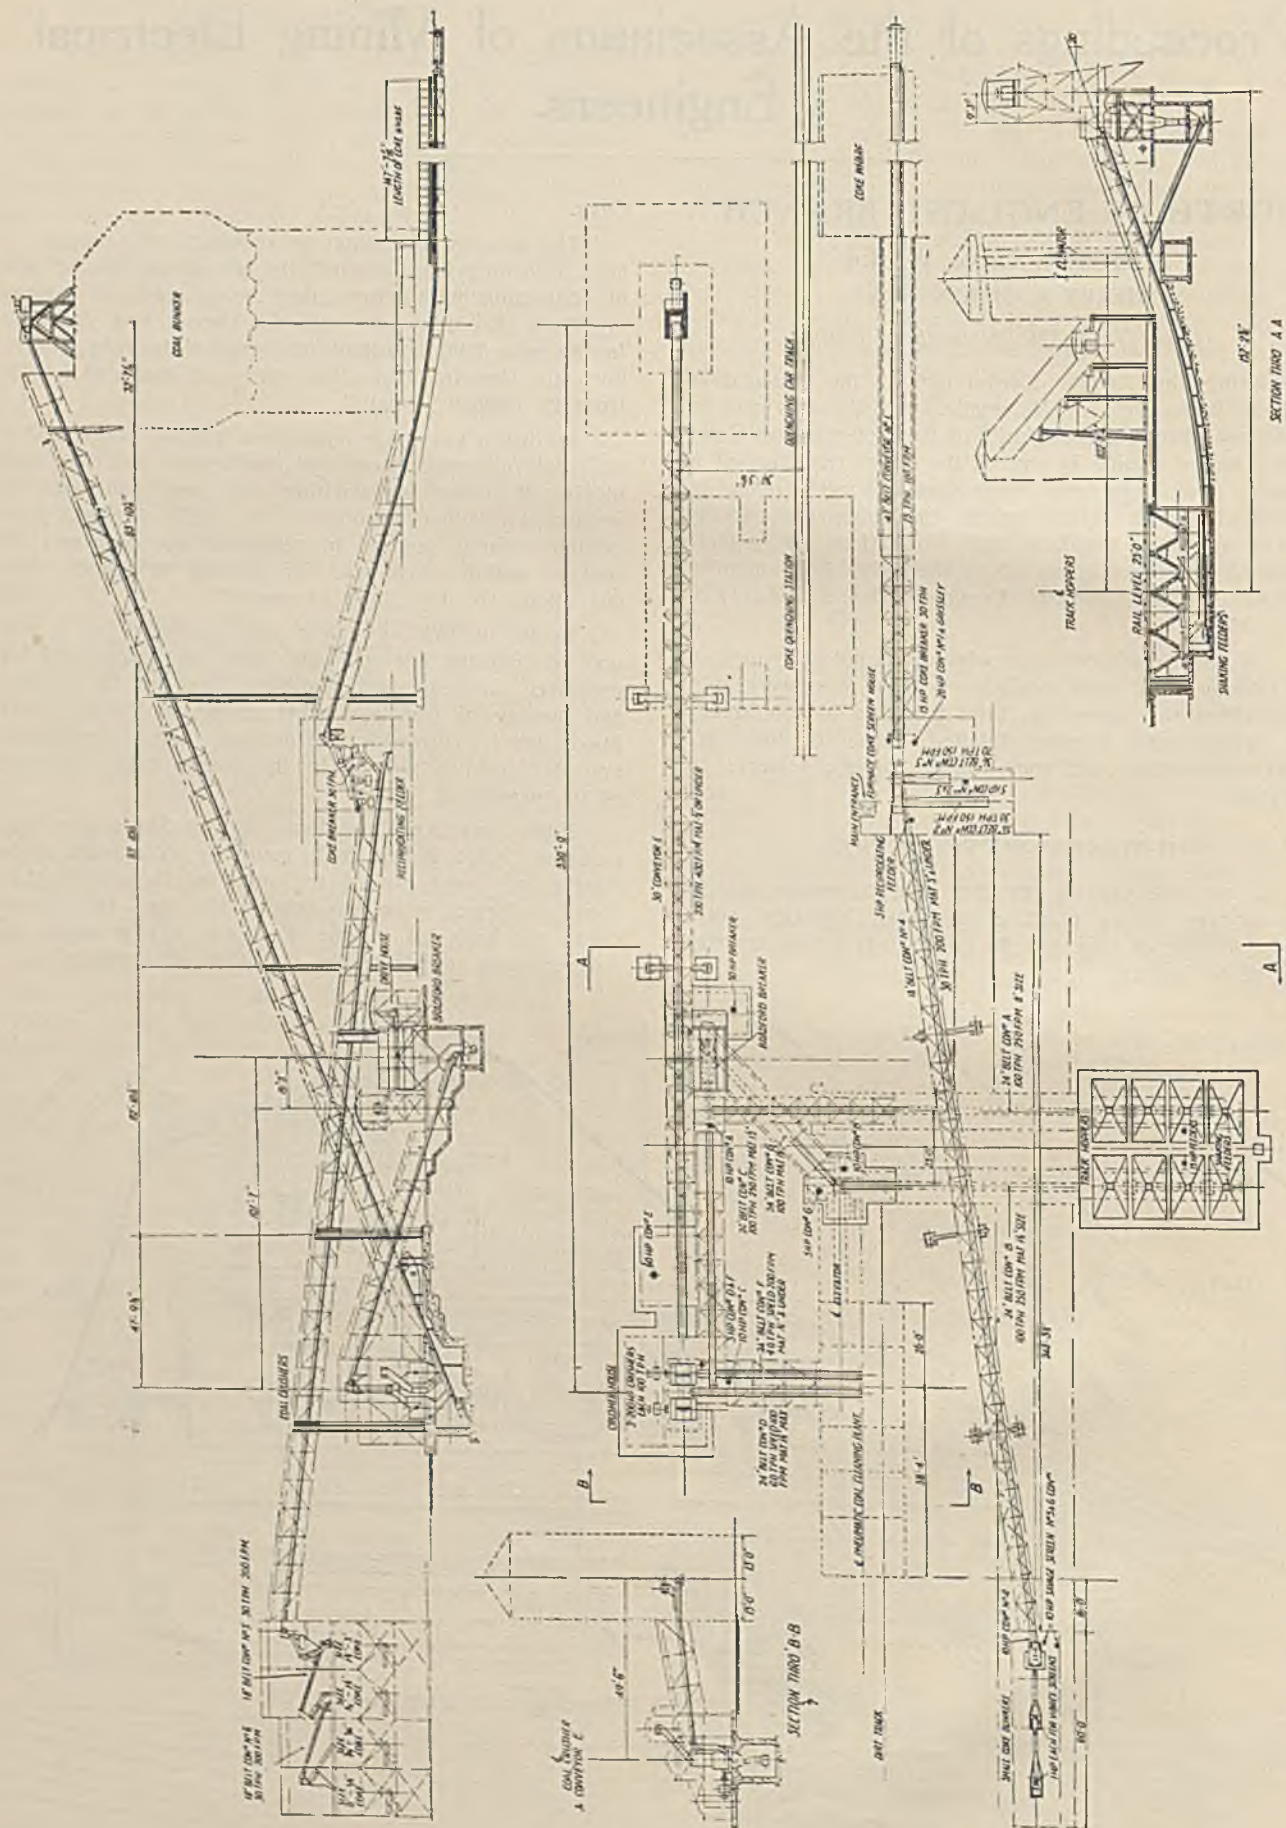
General Arrangement of the Coal and Coke Handling Plant.
